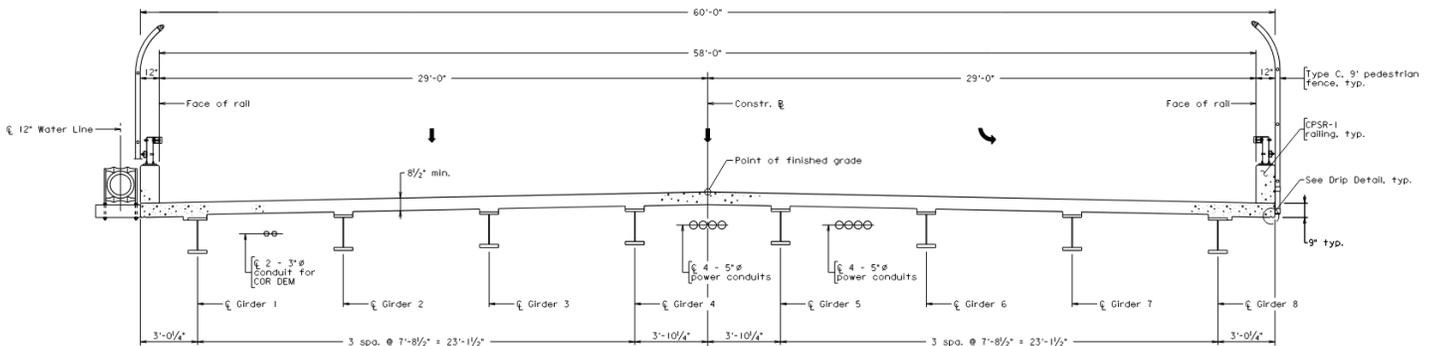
5th Street Bridge RFP Concept Transverse Section
